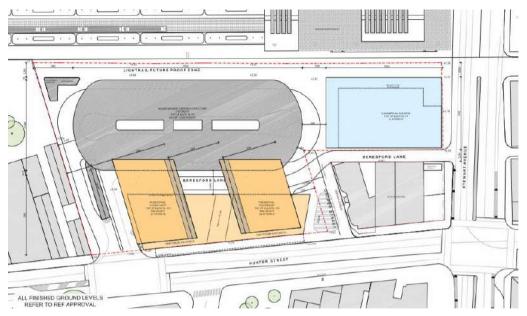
Building envelopes and setbacks concept plan for masterplanned site. Bates Smart
